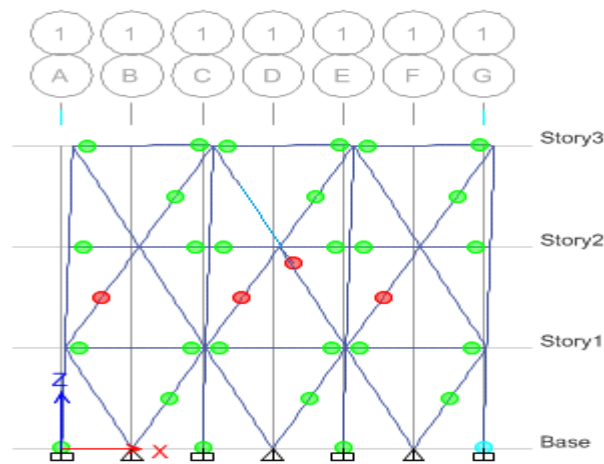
Hinges formed in two story height Diamond braced frame structure.
